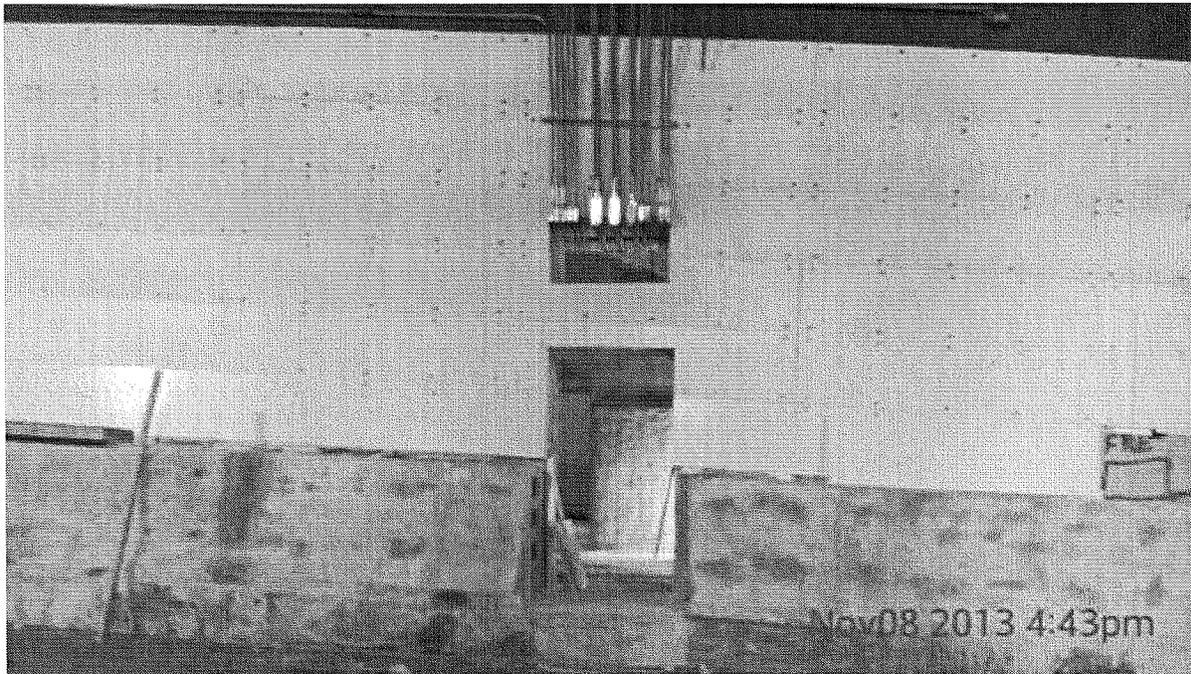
Cross Passage Construction and Panels Installation (November 2013)
